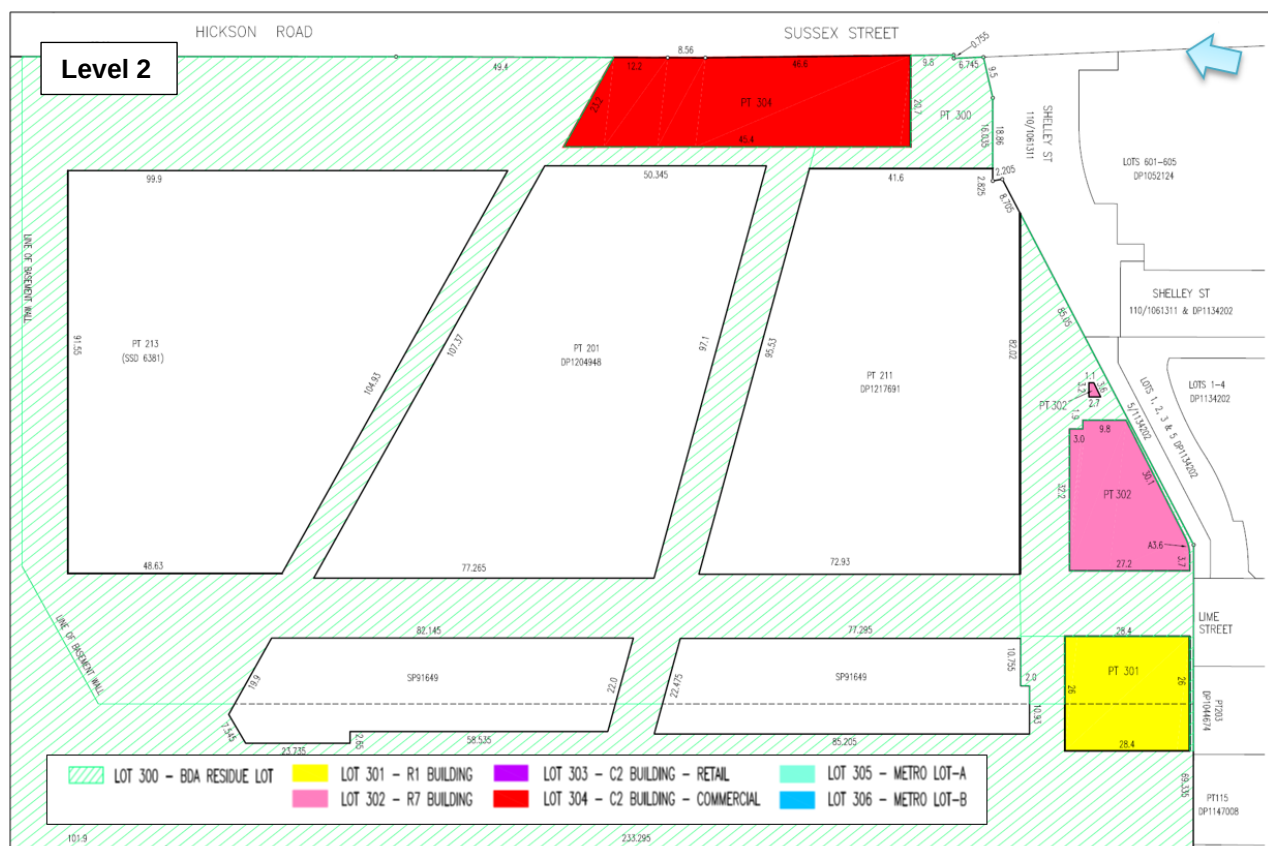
Proposed plan of subdivision for Stage 1A Level 2 and above at Barangaroo South (Source: EIS)
